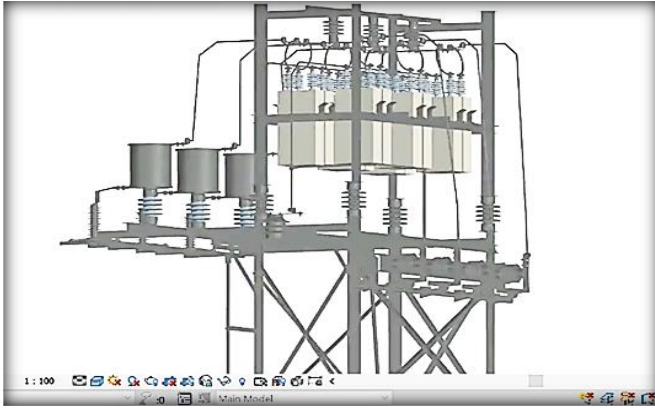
BIM modeling of a capacitor bank for electrical substations
